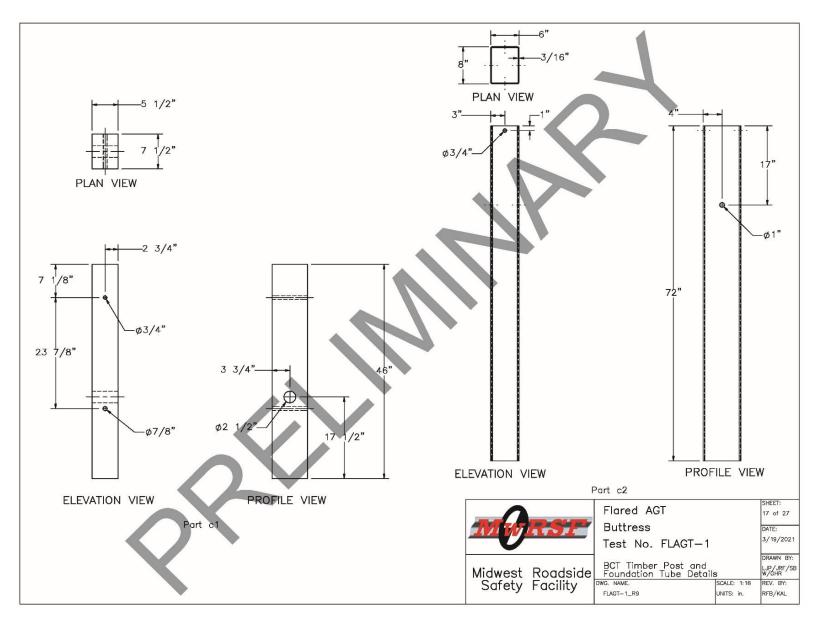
BCT Timber Post and Foundation Tube Details, Test No. FLAGT-1
